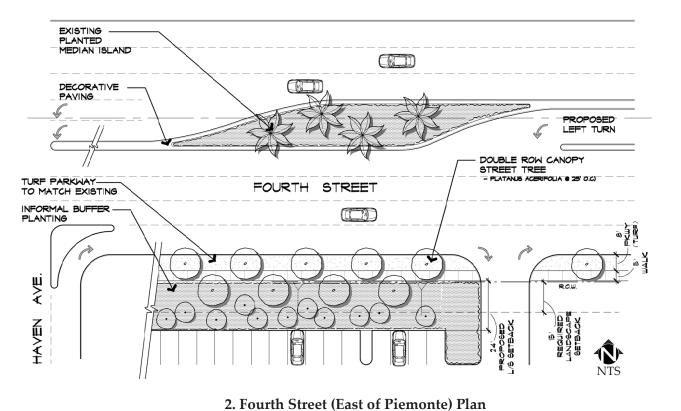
Fourth Street (East of Piemonte) Public Streetscape Section and Plan
